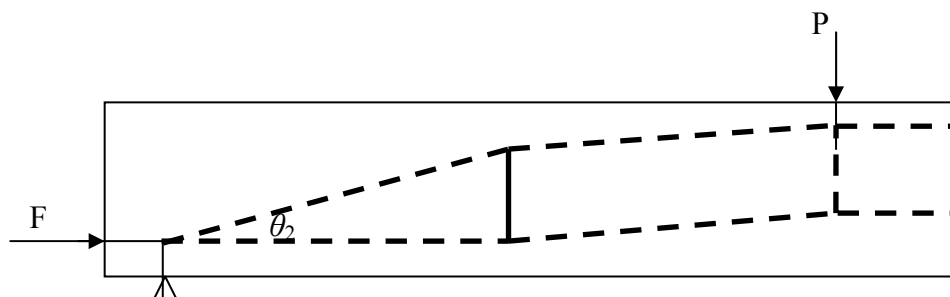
Strut-and-tie model in prestressed beam (Schlaich et al 1987)
